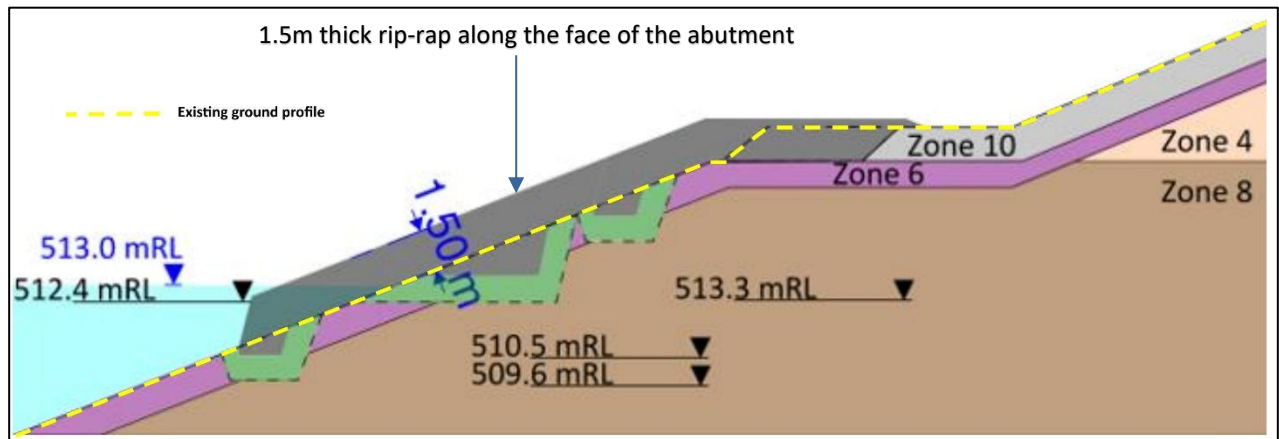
Main dam placement of rip-rap and backfilling of construction bench. Dashed yellow line indicates existing ground profile (excerpt from Pukaki Reservoir Hydro Storage and Dam Resilience Works – Dam Protection Works. GHD 2025).
